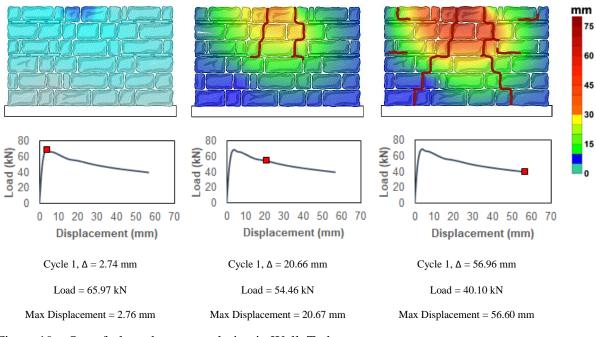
and Figure 19 present the crack development throughout the test in the front elevation of Wall_Stl and Wall_Tmb respectively. Each crack pattern is drawn over the displacement fields obtained from the mesh of LVDTs located in the wall (see Figure 12). The contour maps were obtained through the measurements of all displacements at the frontal wall assuming a linear interpolation. The progress of damage is also associated to a point of the monotonic force vs displacement curve for reference.
